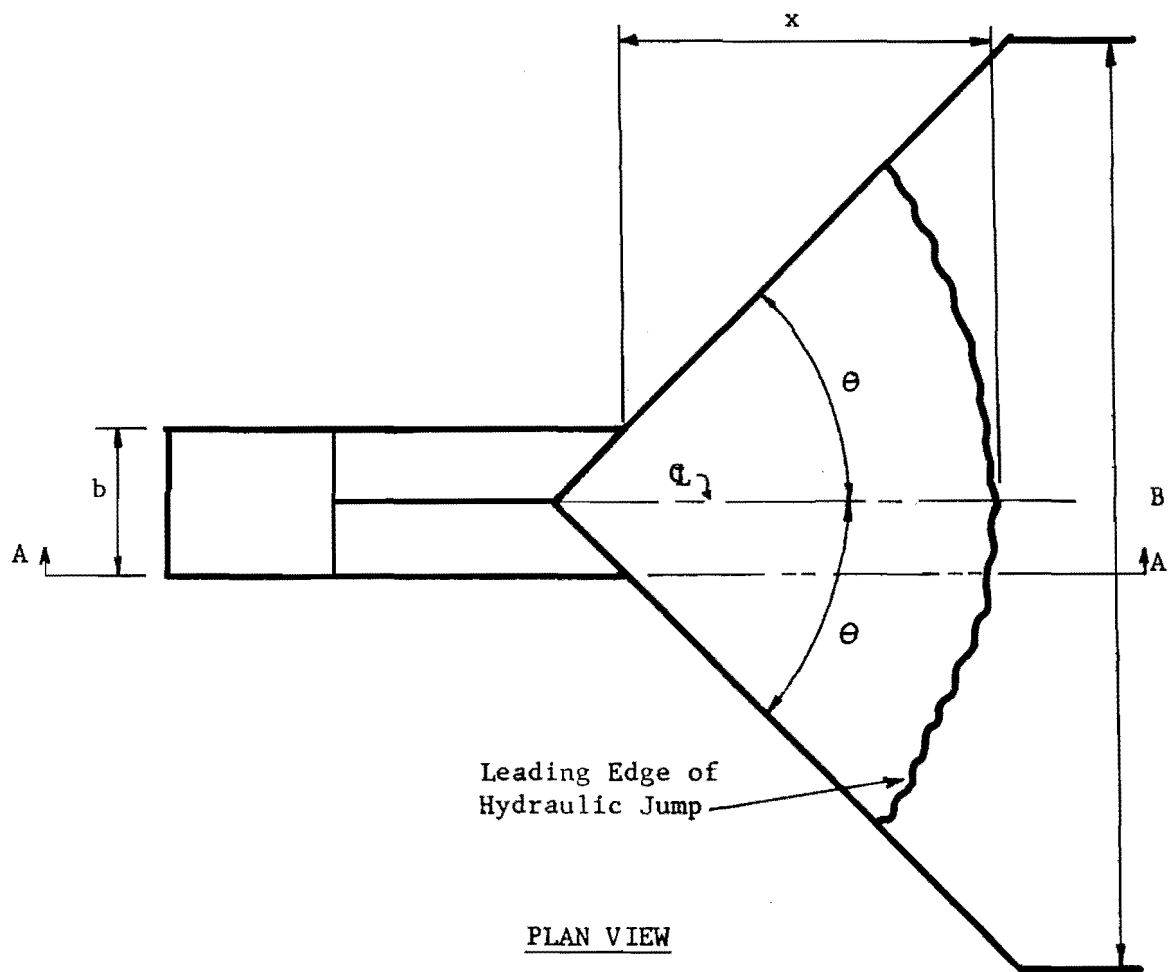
BOX CULVERT WITH GRADUAL V-SECTION CURVED DROP AND VERTICAL WINGWALLS
